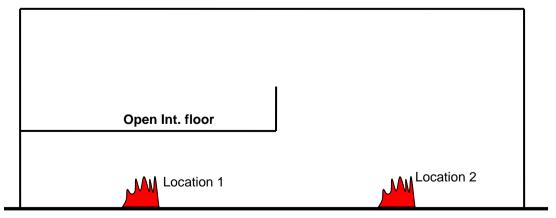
Schematic diagram of a firecell containing an open intermediate floor and fire locations (section view)
